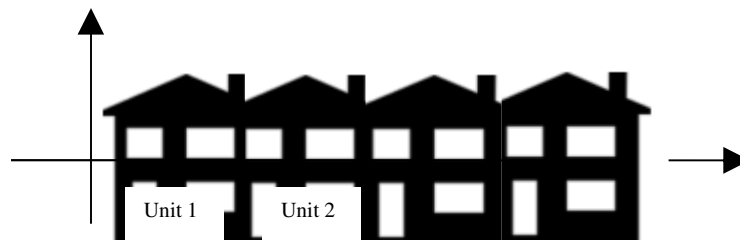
G: Linear Multi-Family Dwelling Arrangement
